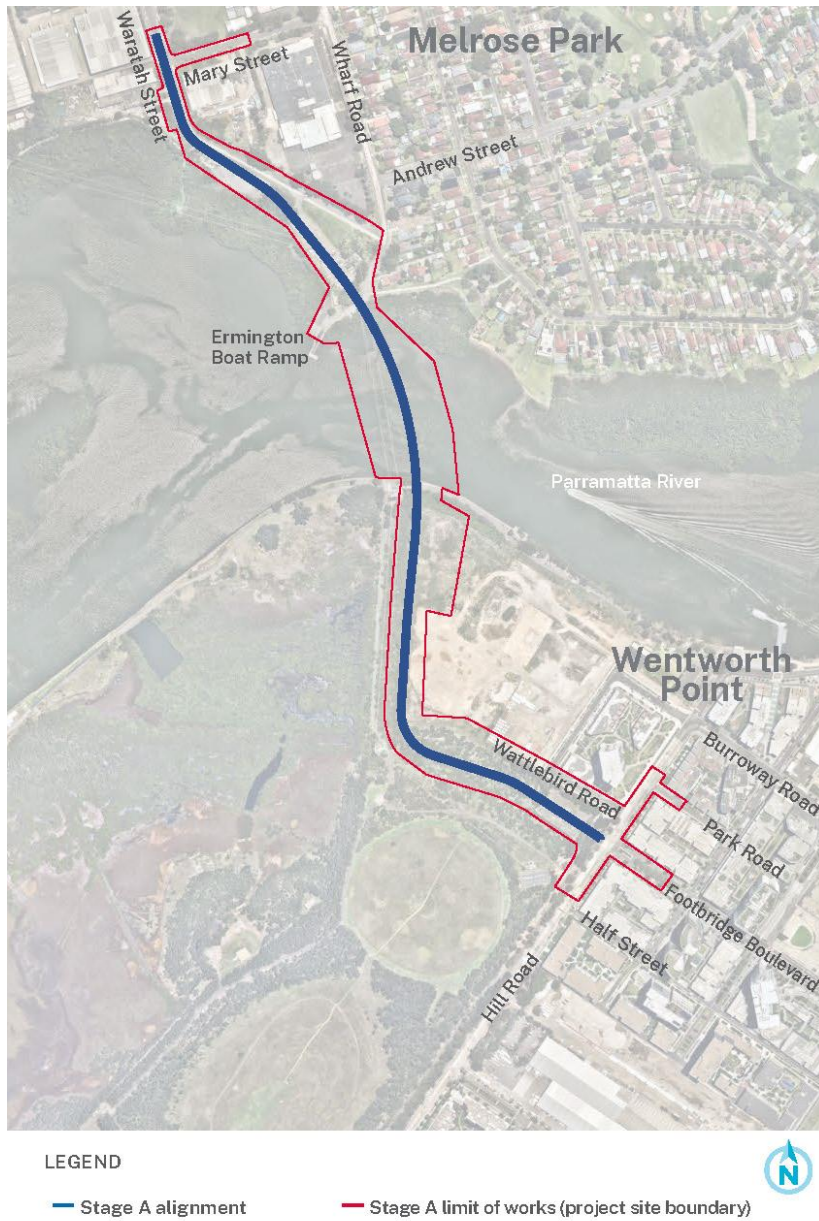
Extent of works for Stage A – Bridge between Melrose Park and Wentworth Point
